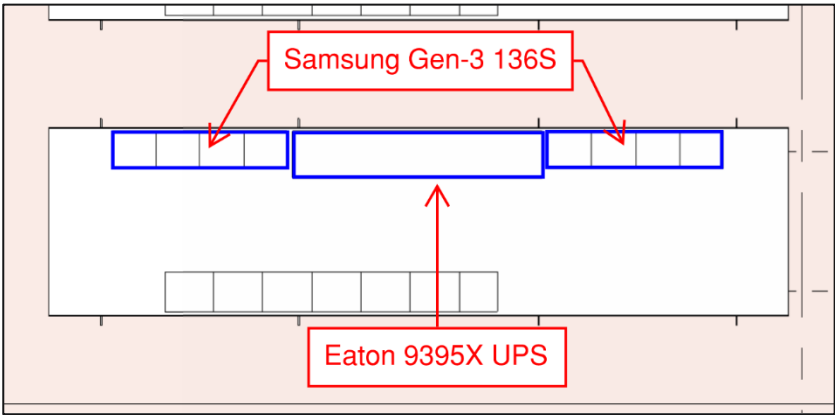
Plan Layout of UPS Skid (Typ.)
